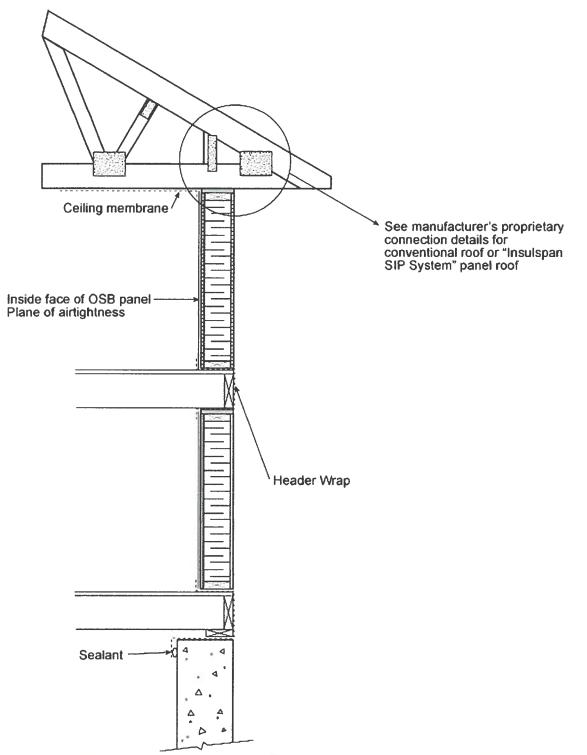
"Insulspan SIP System" – proprietary air barrier system – continuity of seal of the inside barrier face must be maintained.
